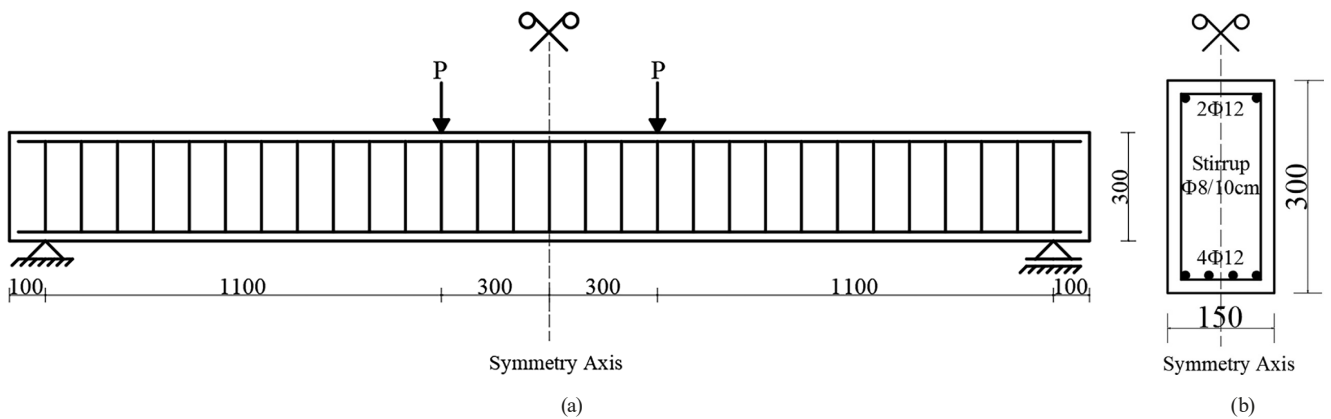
Beam cross sections for the convergence study; (a) longitudinal cross section and (b) cross section
